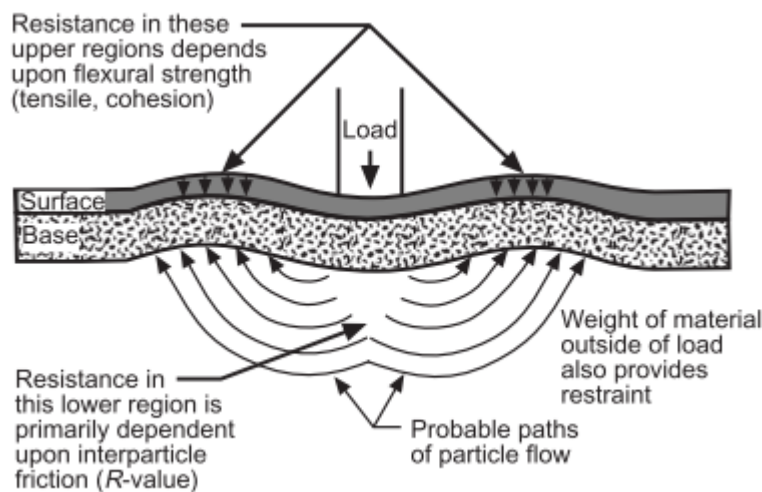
Illustration of possible failure mechanism in pavement with thin surfacing layer (after Hveem & Sherman, 1962)
